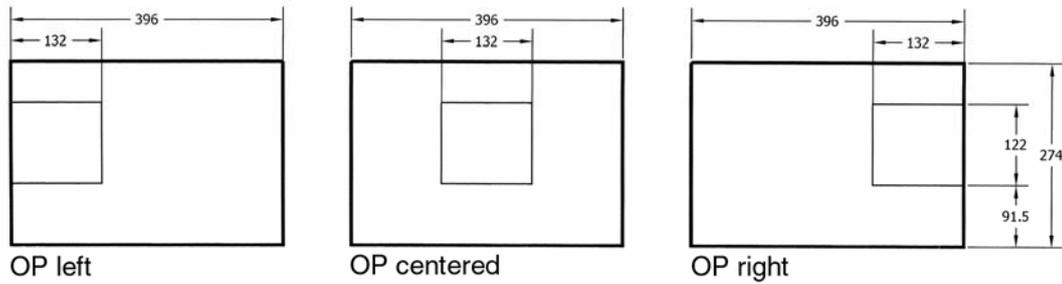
Interior elevations of patient room exterior walls: *OPleft*: left-shifted opening; *OPcentered*: centered opening; *OPright*: right-shifted opening.
